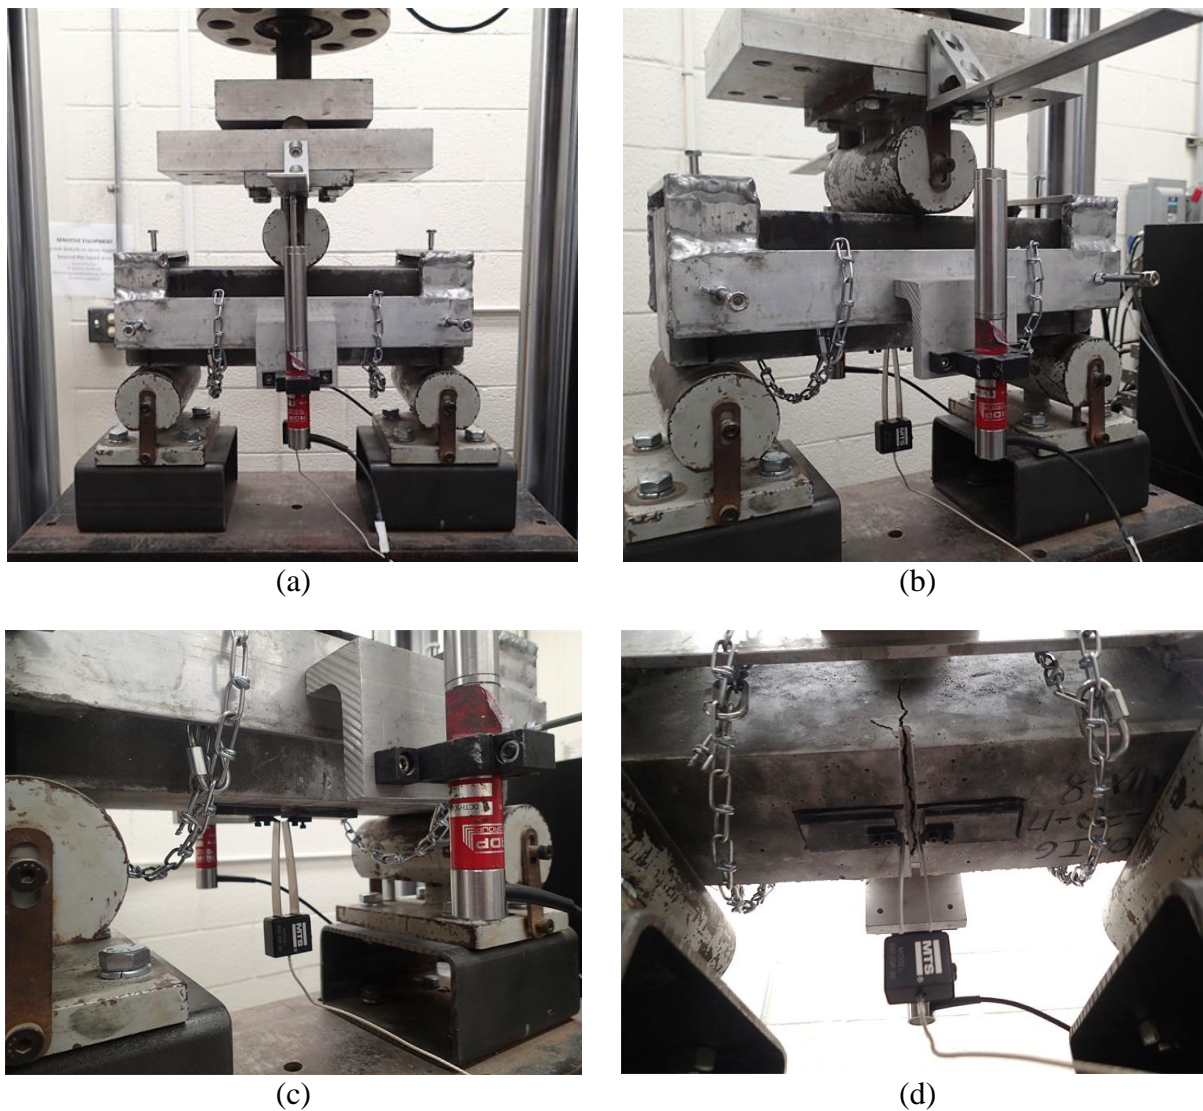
EN 14651 FRC flexural test setup: (a) Side view; (b) Corner view; (c) CMOD clip gage during evaluation; (d) Close-up view of the CMOD during specimen evaluation
